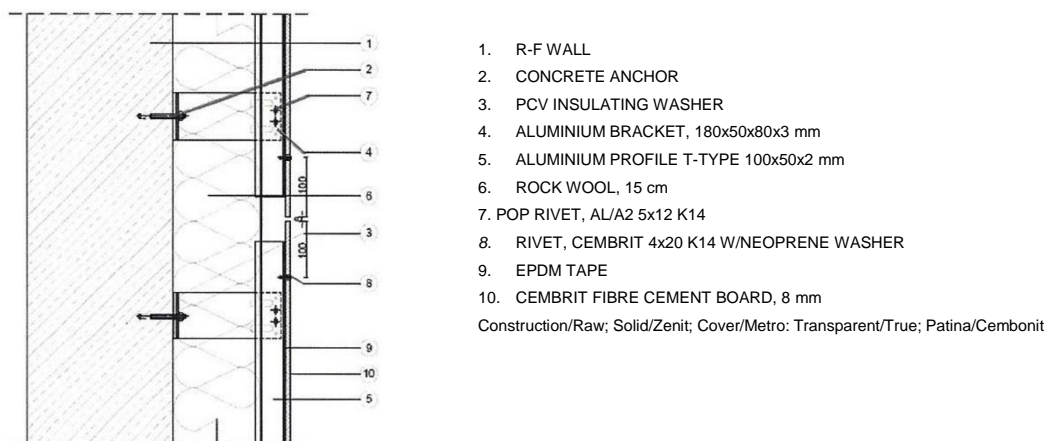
Fragment of a vertical section of Cembrit cladding – example
